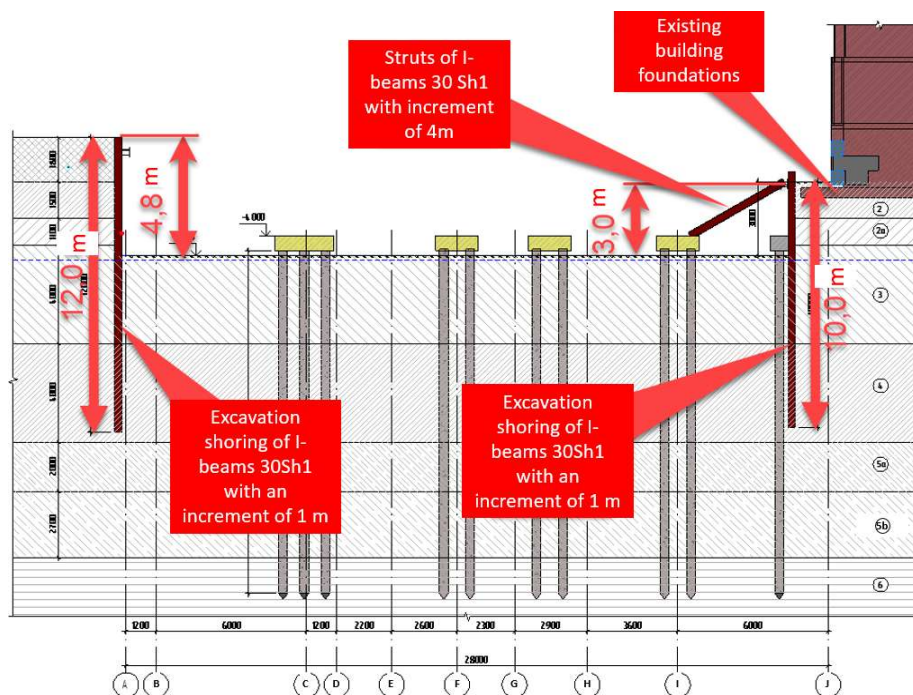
Section 1-1 (6-storey building and tower crane for new construction along the axis «A»)
